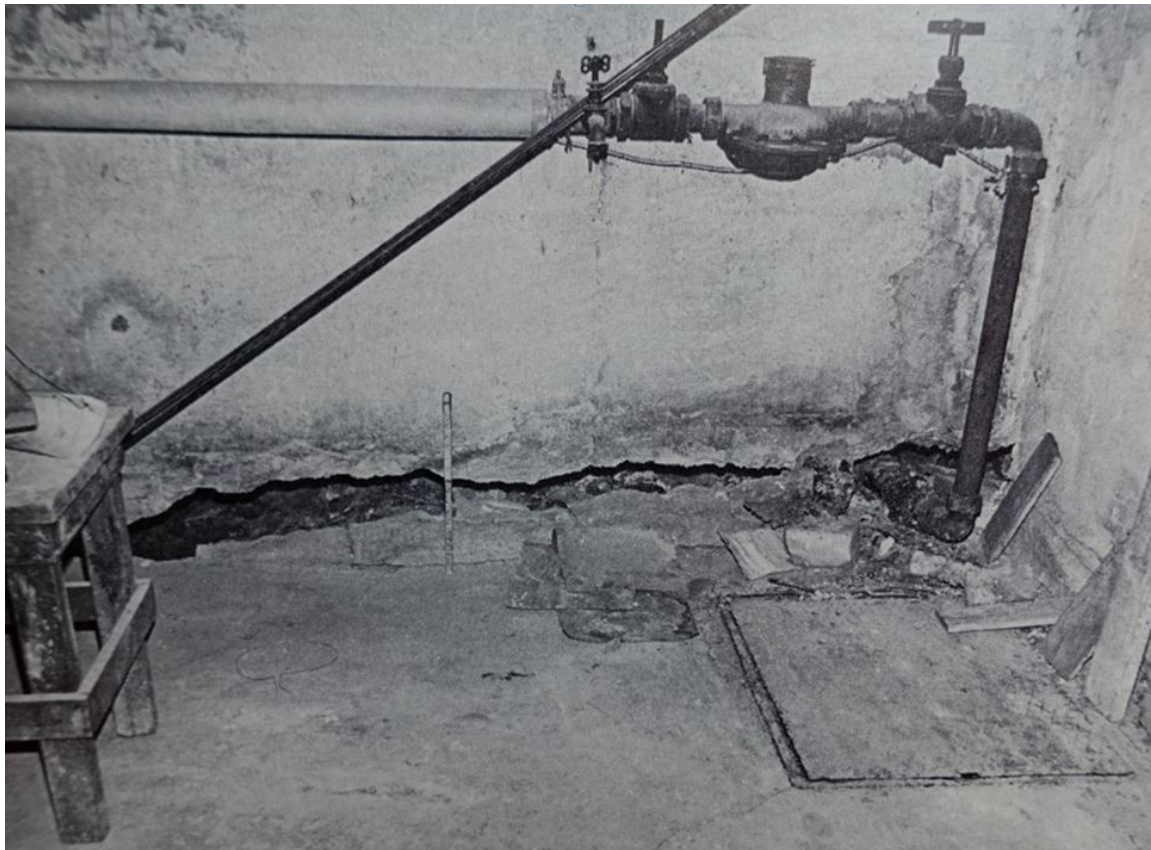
Karlaplan area 1964. Basement severely damaged by subsidence.
